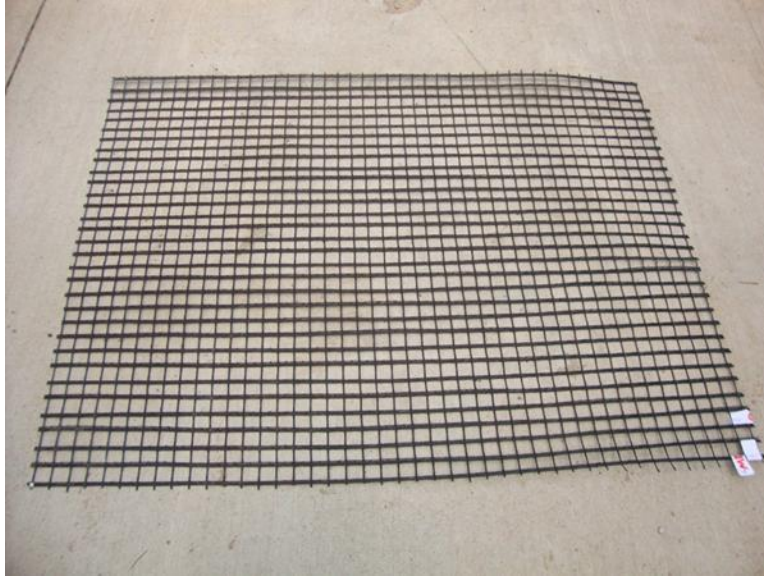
WGG2 geogrid specimen prepared for installation damage tests
